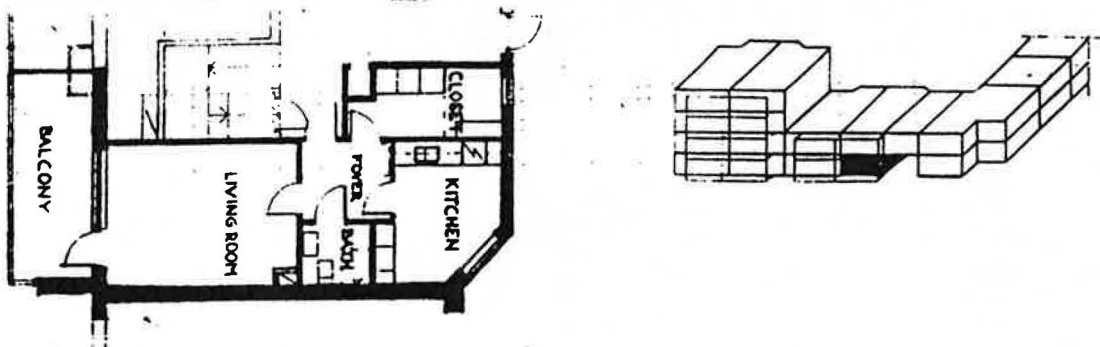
The measured bottom corner apartment in the Skogsälmen building (floor area 39 m^2 , volume 94 m^3).
